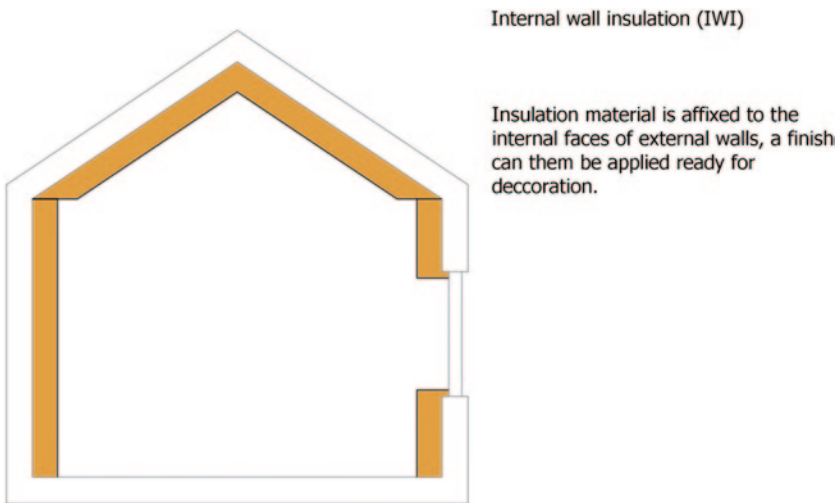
gives an example of the construction of a hard-to-treat wall. Insulation cannot be introduced into the cavity, and it is not desirable to place it externally; the only option is to insulate on the internal face of the wall. Where walls are required to breathe, it may be advisable to use a breathable insulation material such as mineral wool, sheep's wool, hemp or cellulose. Also, a breathable membrane is advisable to reduce the level of moisture entering from the internal environment whilst still allowing water vapour to escape from the wall.
